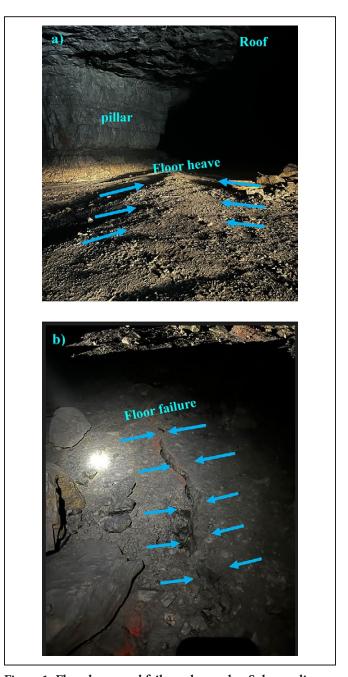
Floor heave and failure observed at Subtropolis Mine caused by high horizontal stress. The affected floor rock is limestone
